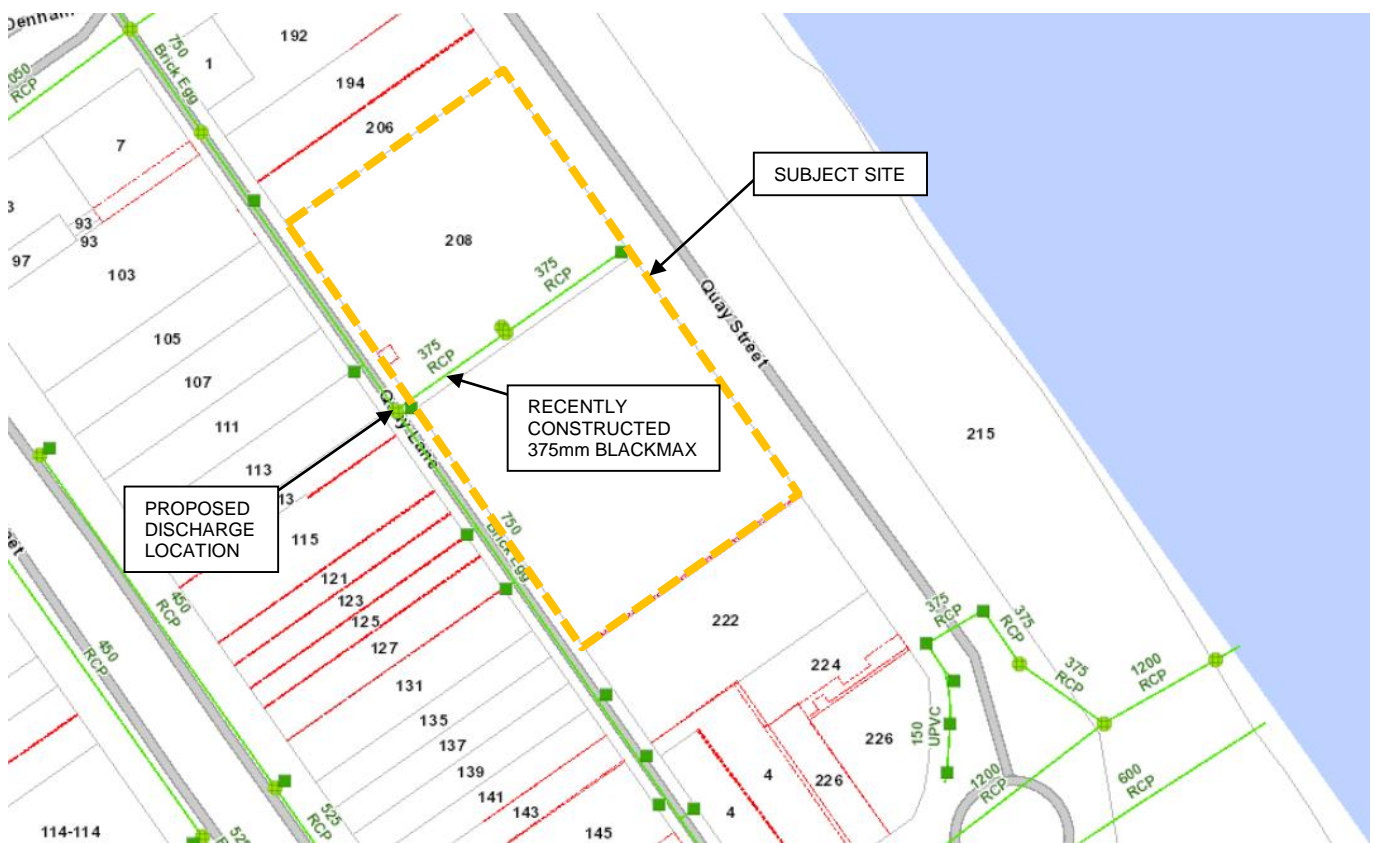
Existing Stormwater Reticulation (Rockhampton Online Mapping, 2018)
